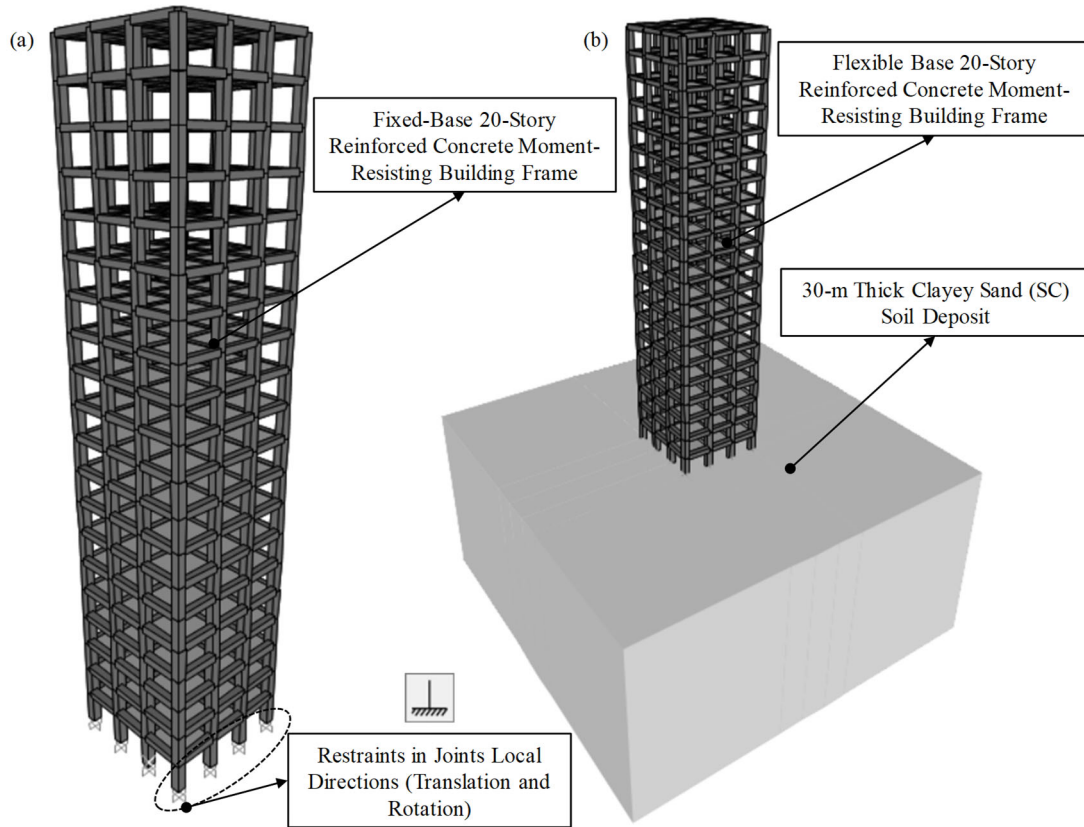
Modeling structural frame in SAP2000 for modal analysis: (a) fixed-base building, and (b) flexible base building
